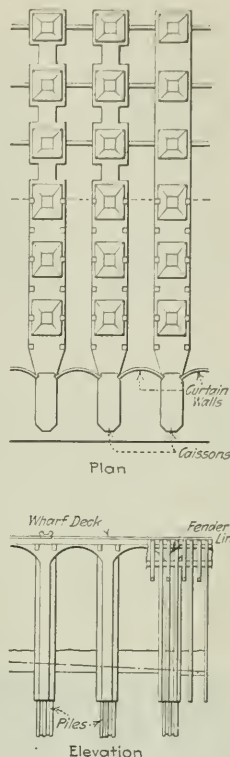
PLAN AND ELEVATION OF FOUNDATION AND SEAWALL
